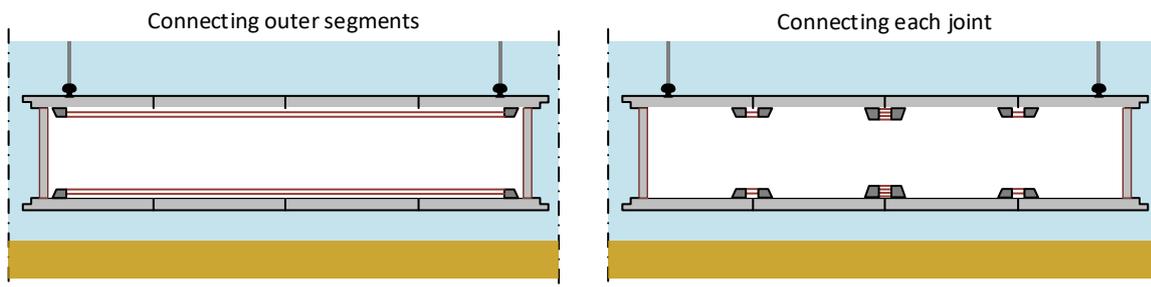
, PRESTRESSING DESIGN VARIANT (1/2) ; LONGITUDINAL VIEW
